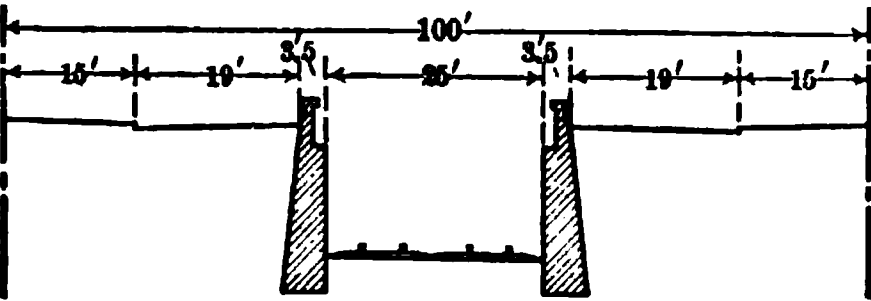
Showing Open Cut for Rapid Transit Railroad with Retaining Walls in Street 100 ft Wide, Constructed with a View to Converting it into a Tunnel when Necessary.
